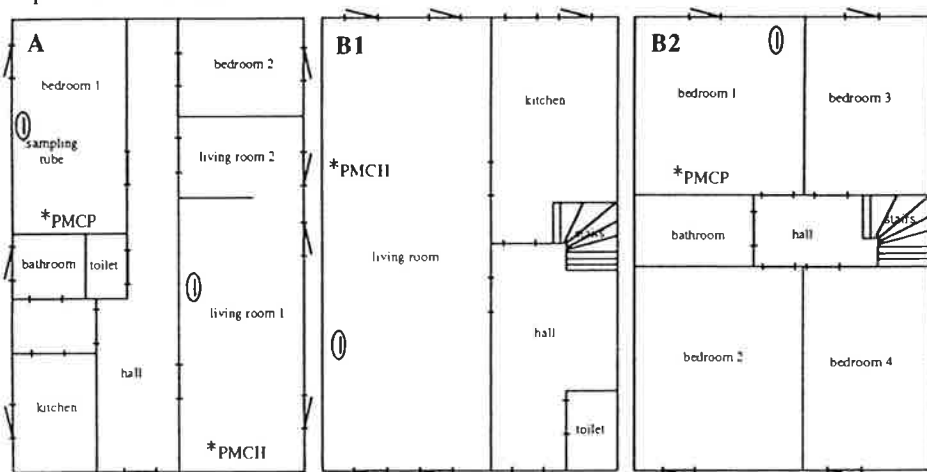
Plan of a typical flat (A) and single-family house groundfloor (B1) and first floor (B2)
